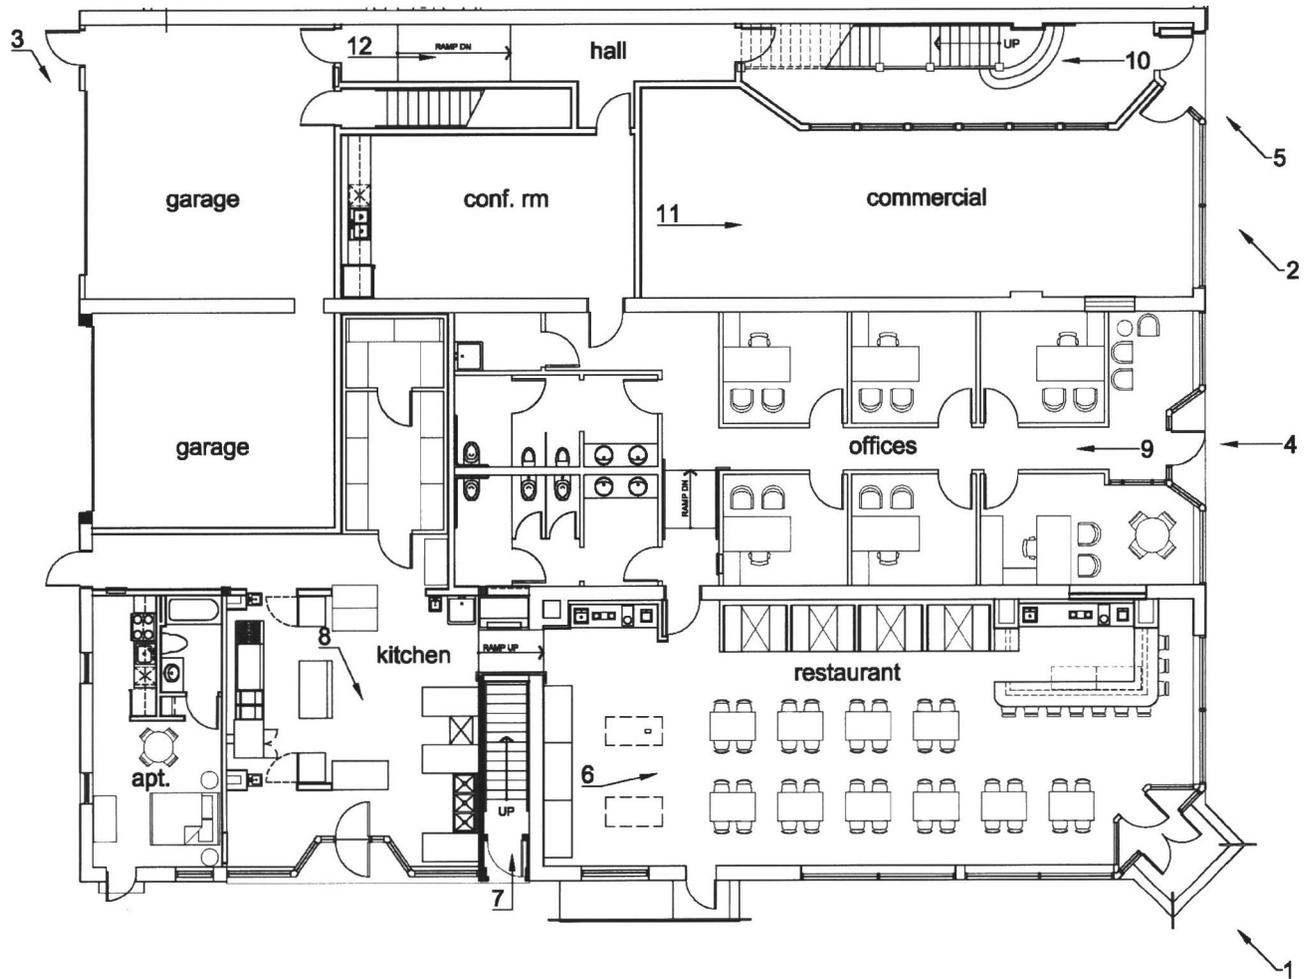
First Floor Plan Post-Rehabilitation Lots 13-15 – Plan by APMA March 2011 – not to scale.
